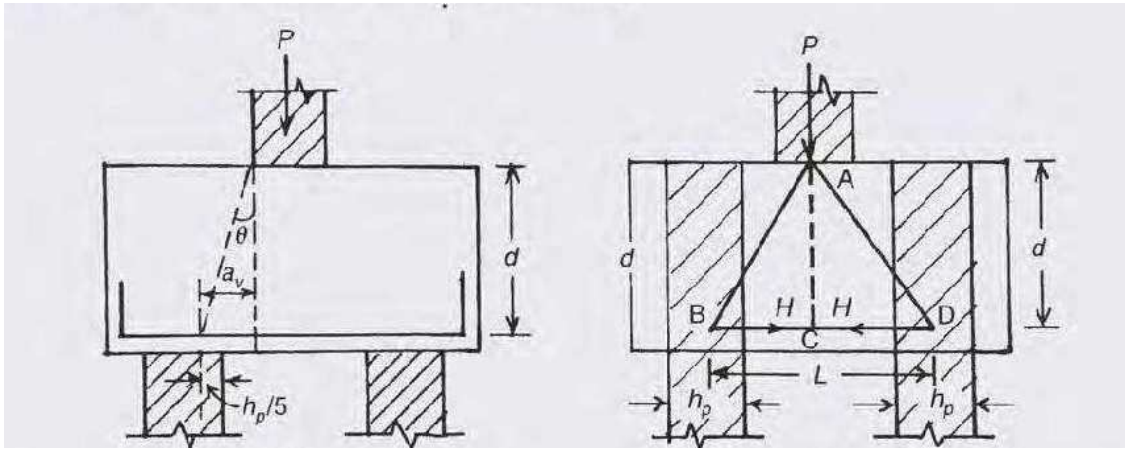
Design of pile-cap reinforcement by truss theory.
